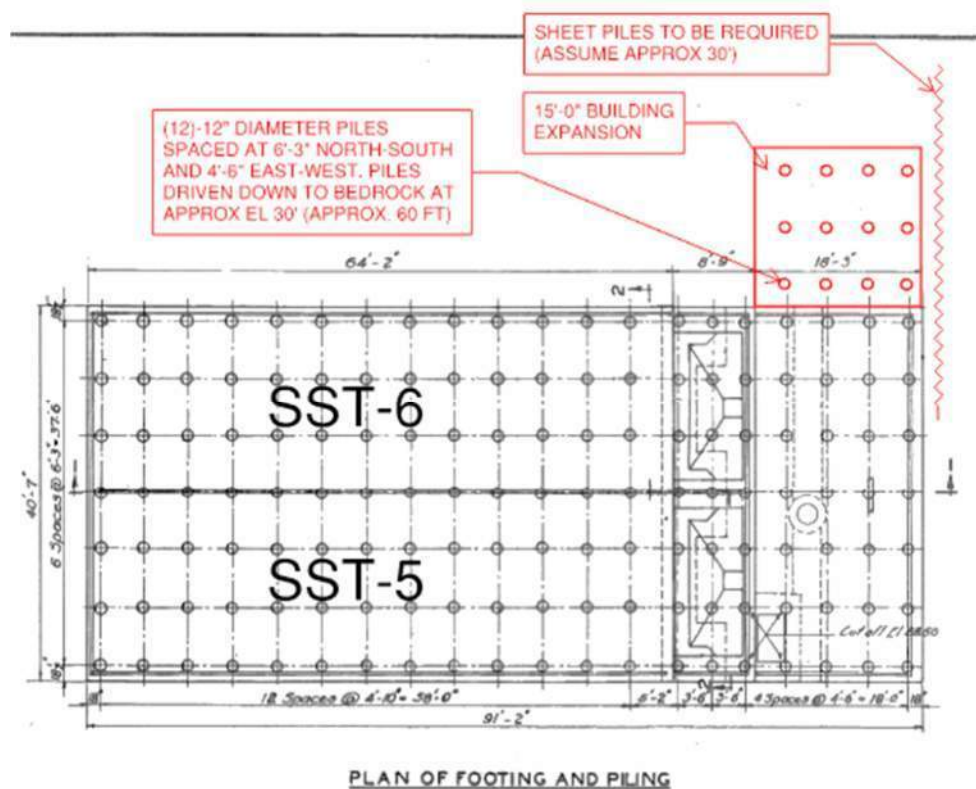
SSTs 5/6 Pump Building Expansion - Preliminary Foundation and Pile Layout
